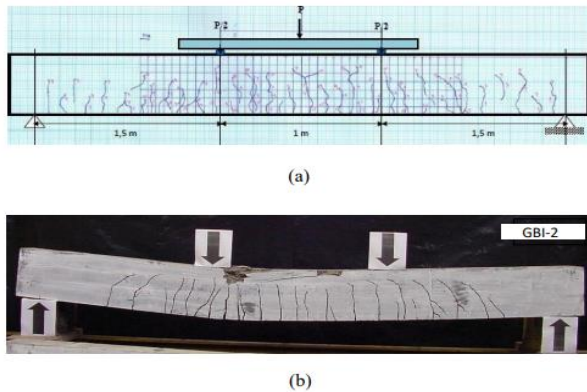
Failure pattern of the beams: (a) Conventional Reinforced Concrete Beam [56];
